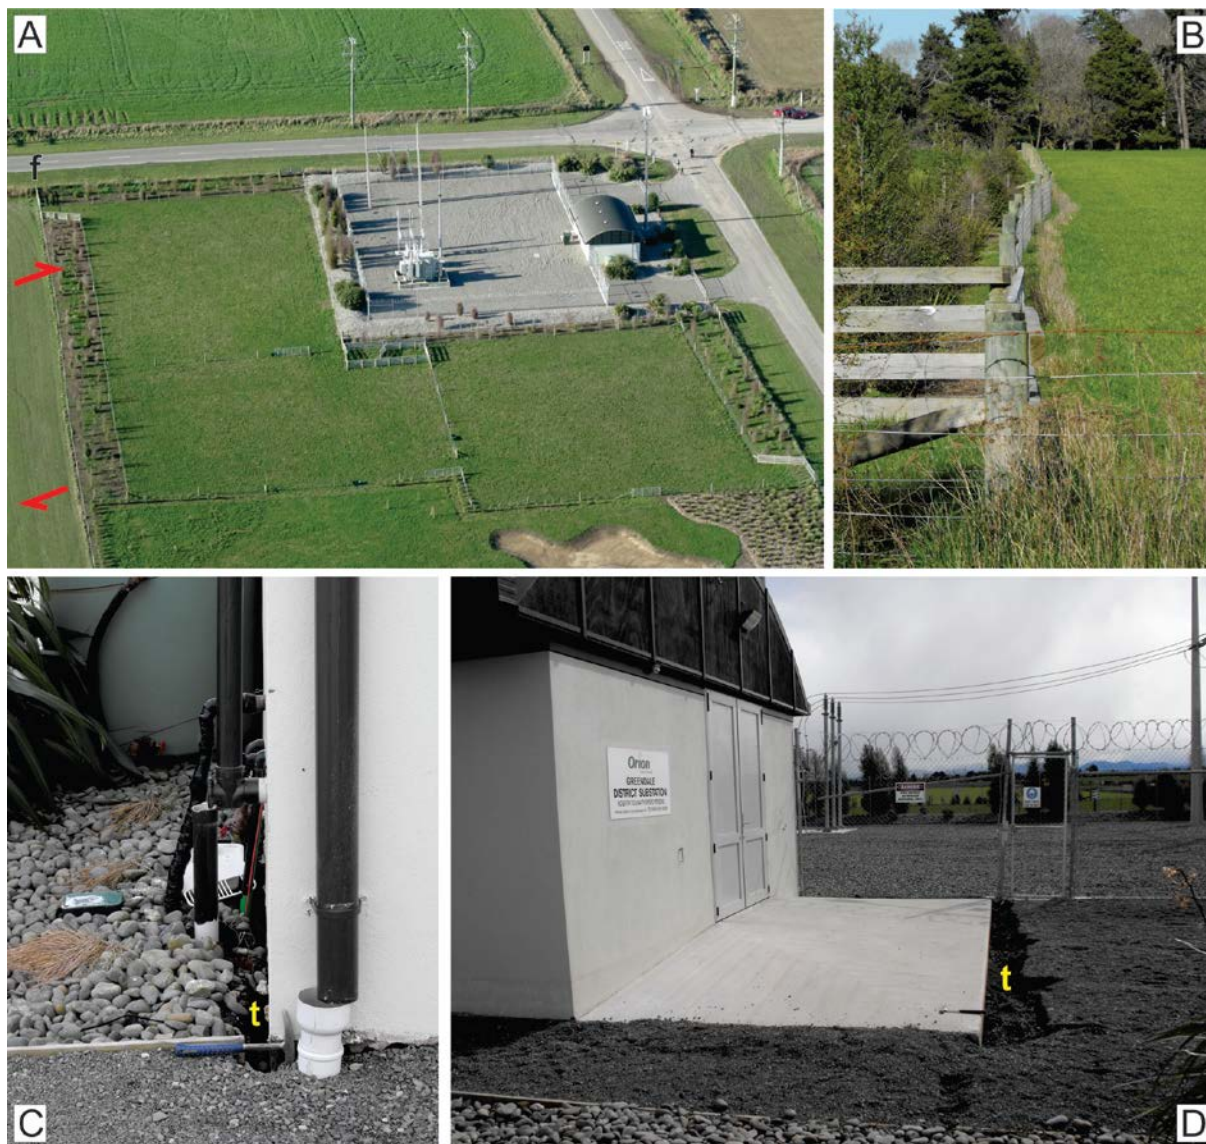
Greendale substation and Greendale Fault surface rupture; see Figures A2.7 and A2.8 for location. (A) Aerial view looking northeast. Red arrows denote location, strike and sense of lateral displacement of the surface rupture deformation zone. Photo by Richard Jongens. (B) View looking southwest along fence line adjacent to the substation that crosses the surface rupture deformation zone and records the amount, width and distributed style of fault displacement here (camera location for B is shown by black 'f' in A). Photo by Russ Van Dissen. (C, D) Views looking northwest. 't' is where soil has pulled away from the building's foundation. See text for details. Photos by Russ Van Dissen.
